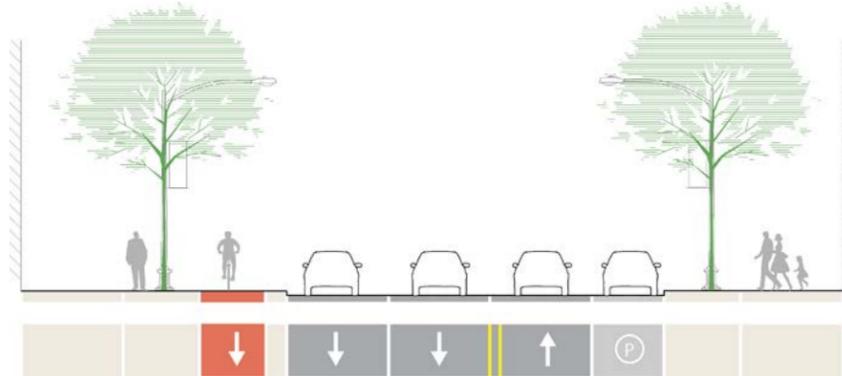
Fifth Street typical section Brazos Street to I-35
